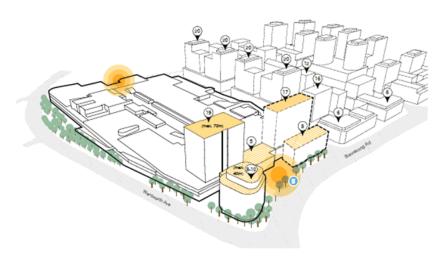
Westfield Eastgardens – Proposed masterplan concept
